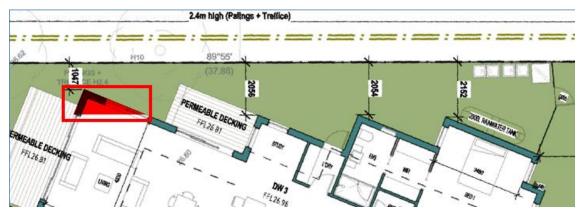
Northern ground floor plan of Dwelling 3 showing staggered setback, with area of setback noncompliance shown (red)
